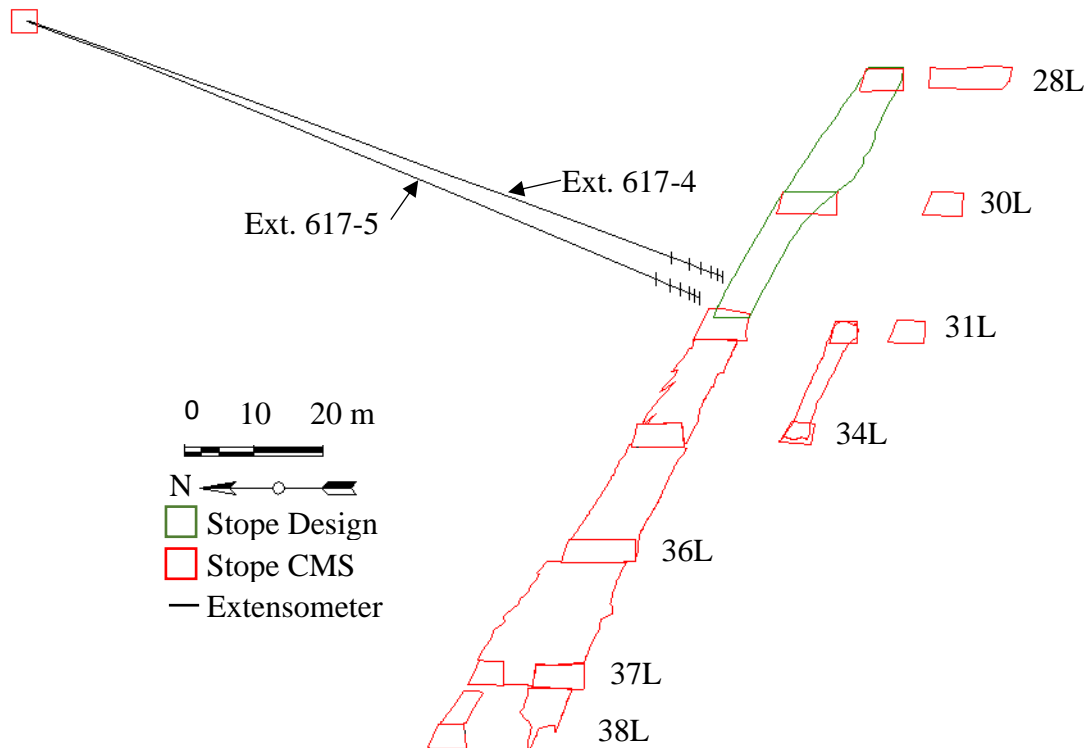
Cross section view along XC-2 of Santoy longhole panel looking east showing the stope design outline, extensometer locations, surveys, and CMS.
